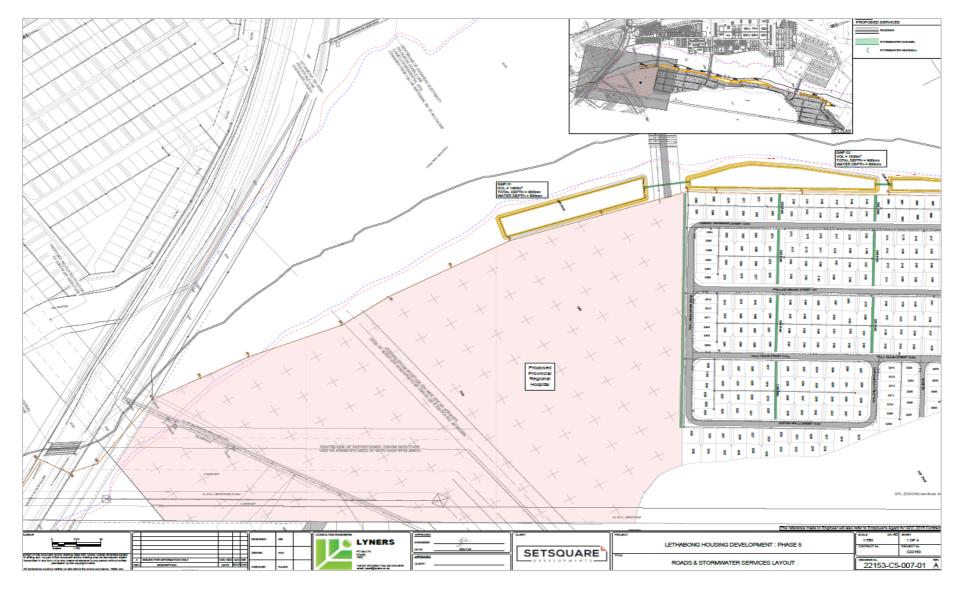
Roads and Stormwater layout (Lyners, 2022).
